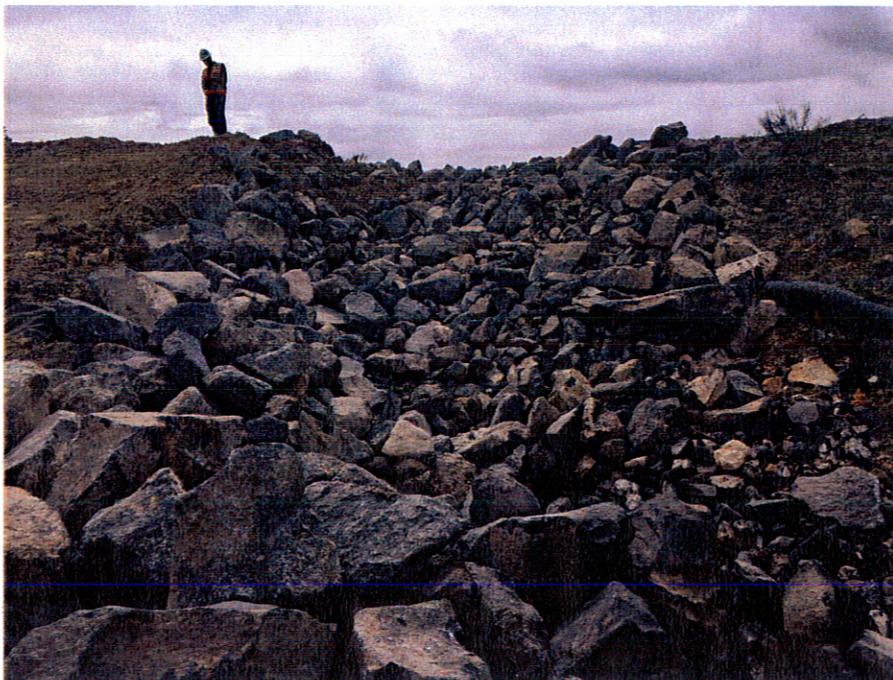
Reconstructed Pond 3 Spillway. View from West to East.
